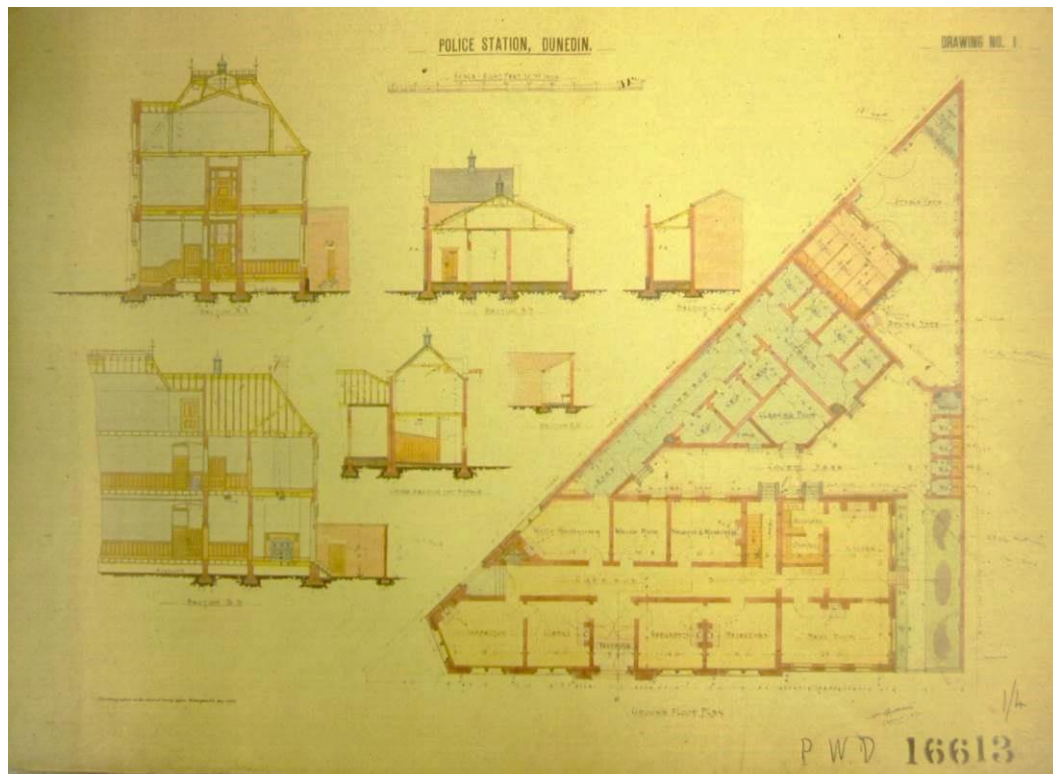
Ground floor plan and sections, Dunedin Police Station. Public Works Department 16613, Drawing 1. (Source: Dunedin City Council Archives).
